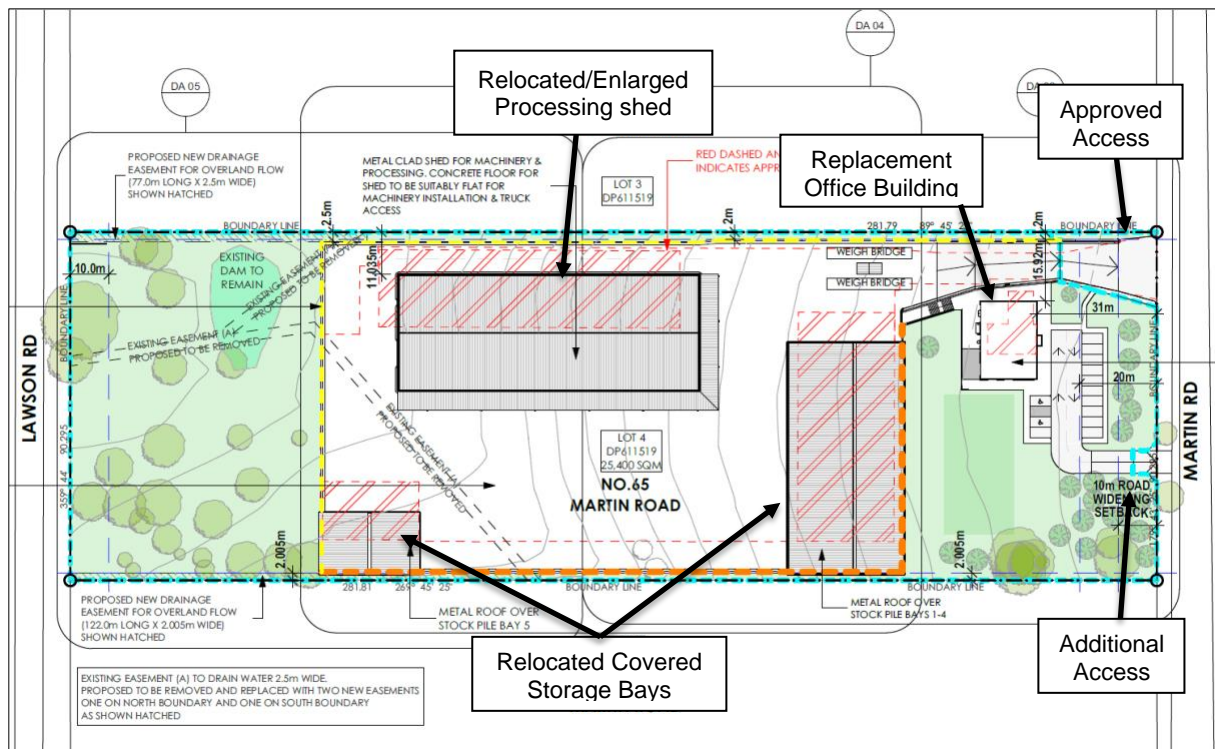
Site Layout as proposed (red-hatched areas are buildings as approved)
